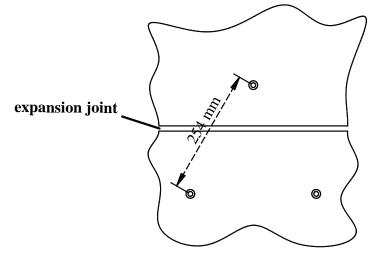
Scheme of location of the gap gauge bolts towards the expansion joint.
